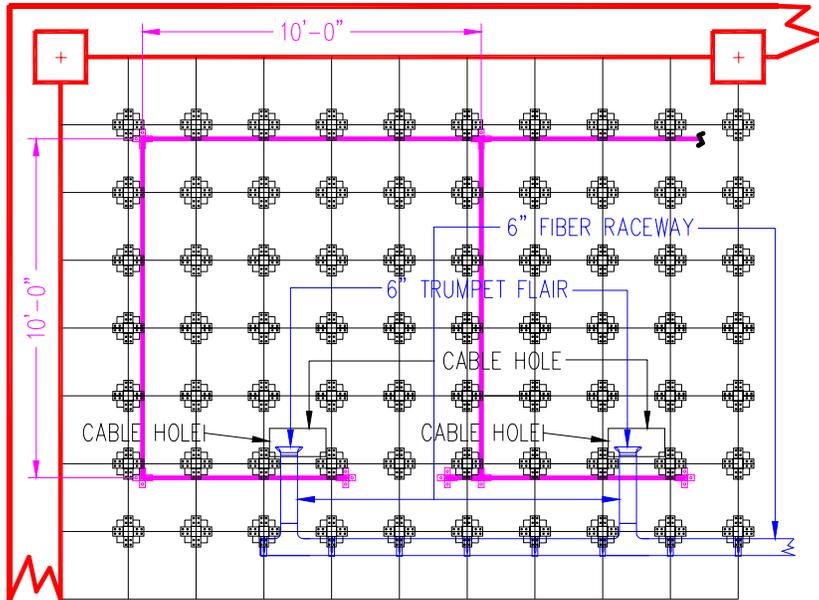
TYPICAL RAISED FLOOR CAGED COLLOCATION
